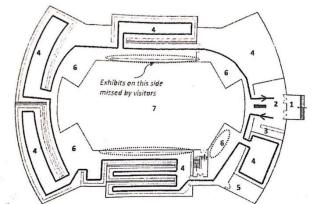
Ground floor plan (Source: (Sunar, 2018))
